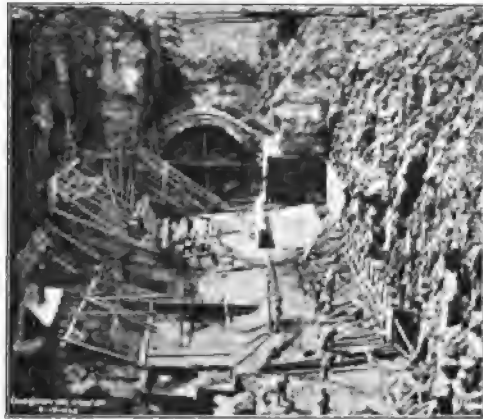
NEW YORK SUBWAY: EXCAVATION FOR STATION AT MOTT AVENUE.
